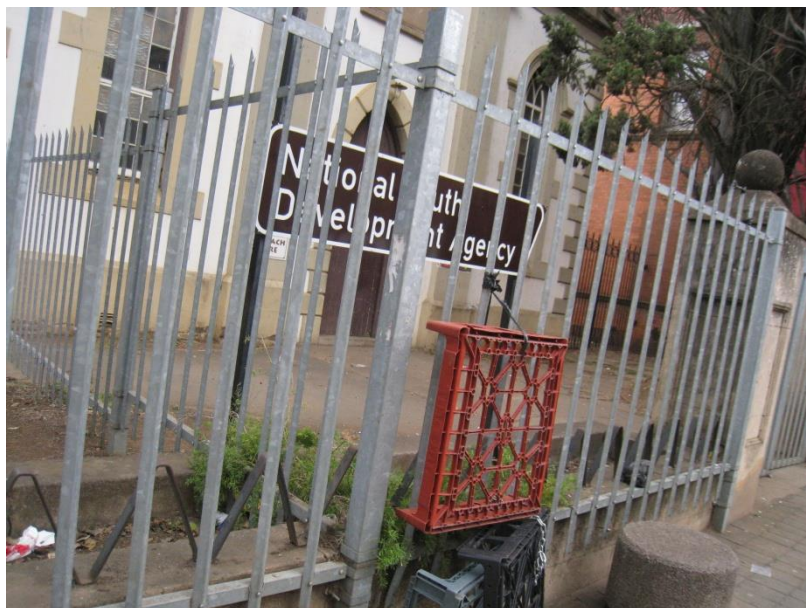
Junction between wall, fixings of the palisade onto the wall, and the wall pavement interface
